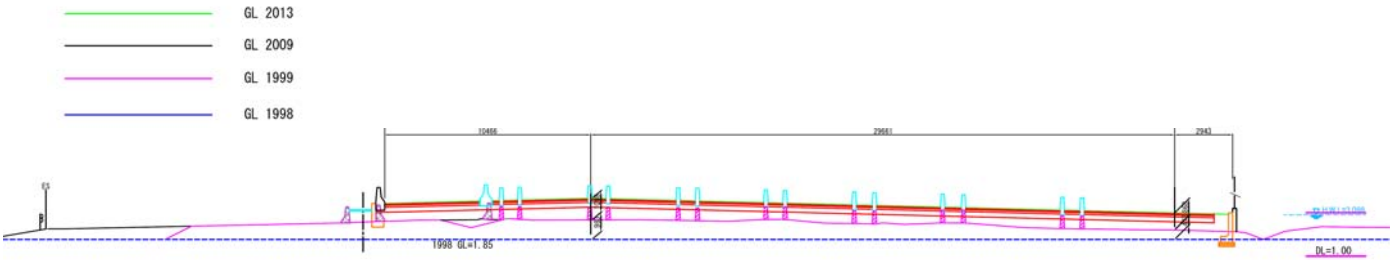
Studied Cross Section (Around Sta.25 Toll Gate Area : BH-1)
